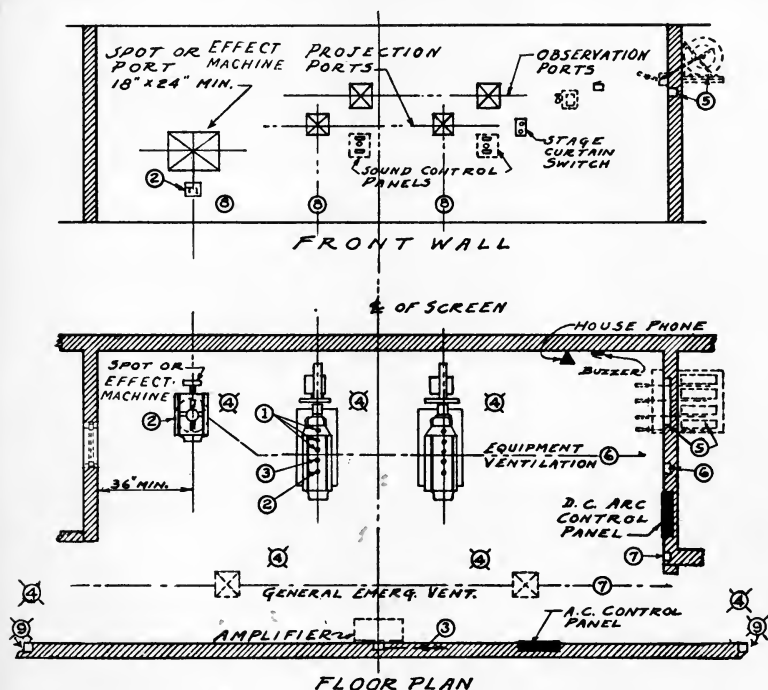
Projection room equipment, showing conduits, ventilation systems, lights, and switches.
